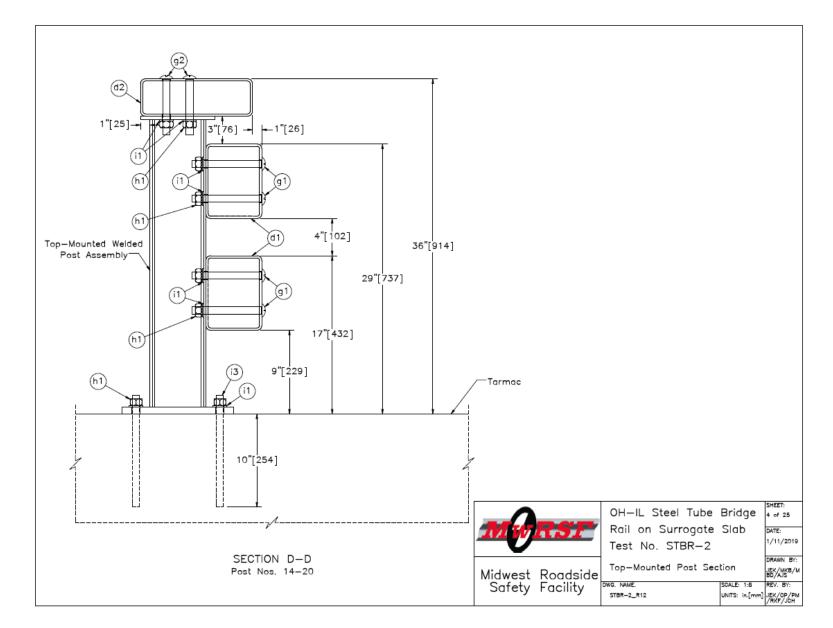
Top-Mounted Post Section, Test No. STBR-2
